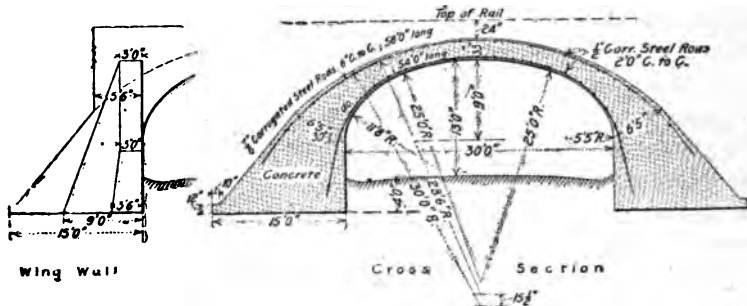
Arch Culvert, L. S. & M. S. Ry.
